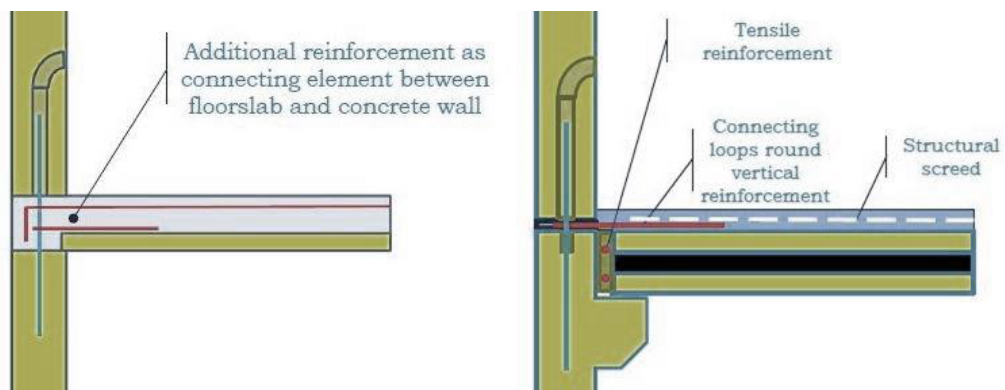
(Left) Detail connection plank floor to wall (Right) Detail connection hollow core slab with wall (Hordijk & Lagendijk, 2014)
